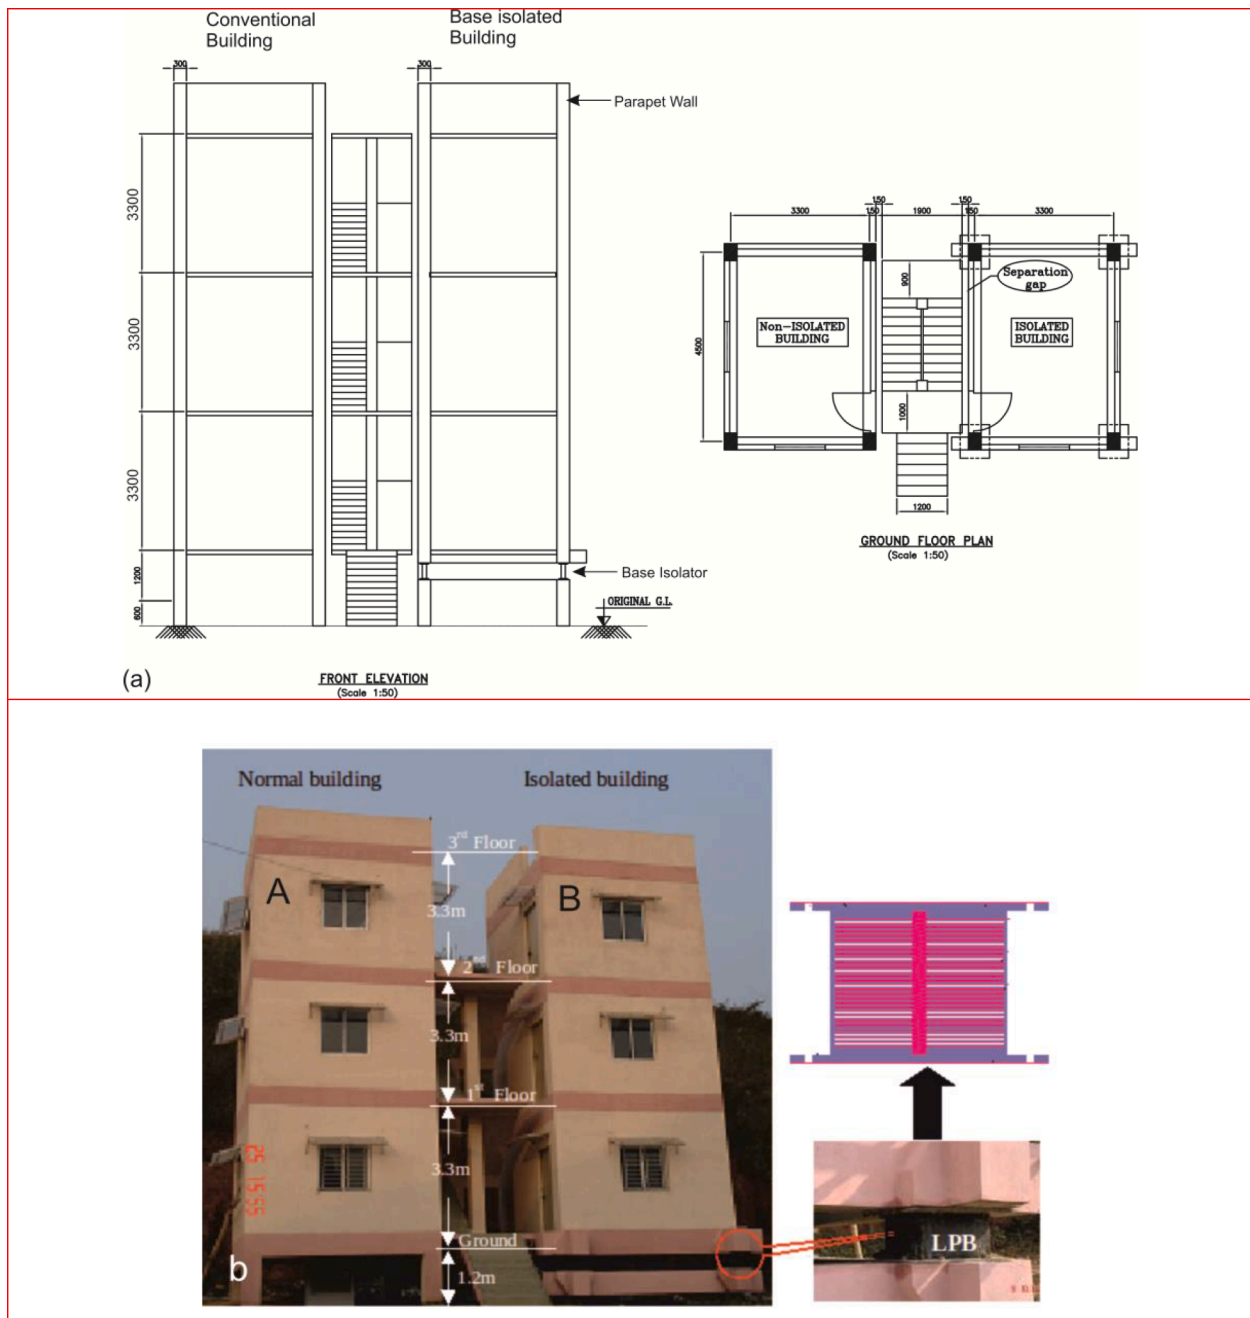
(a) Plan and elevation of conventional and isolated building showing position of isolators; (b) Isometric view of the buildings located in Guwahati.
